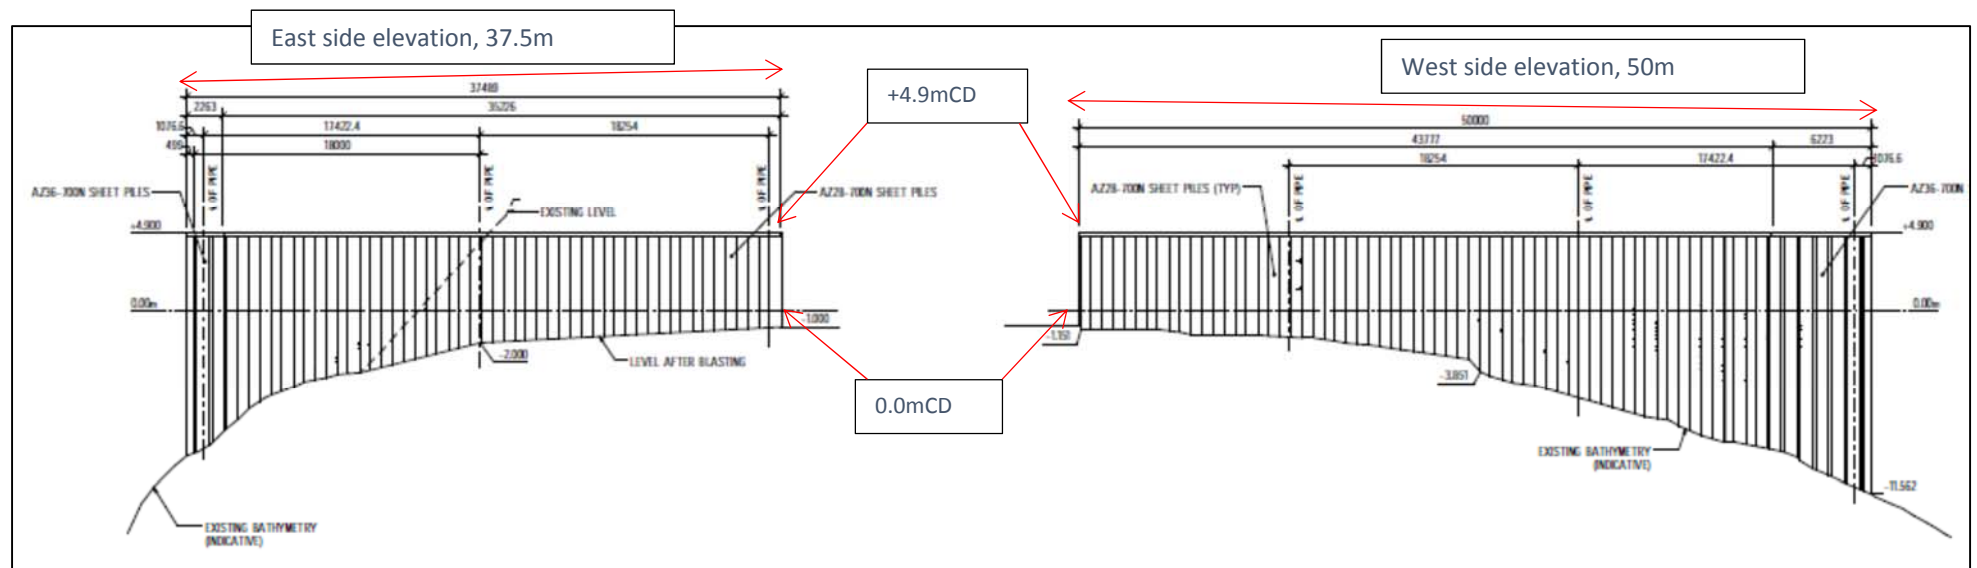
Rothera Wharf Preferred Layout – Elevation of side walls
